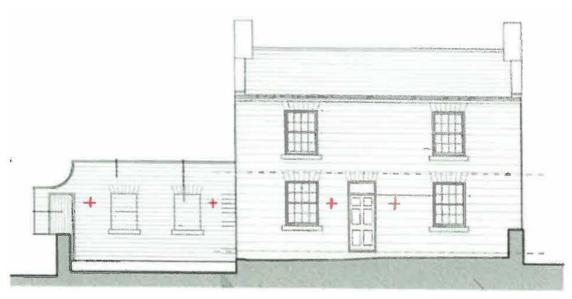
Existing front (northwest) elevation with markings of proposed fittings. The red crosses indicate the position of the proposed external lights to be installed 1.7m above ground level.
